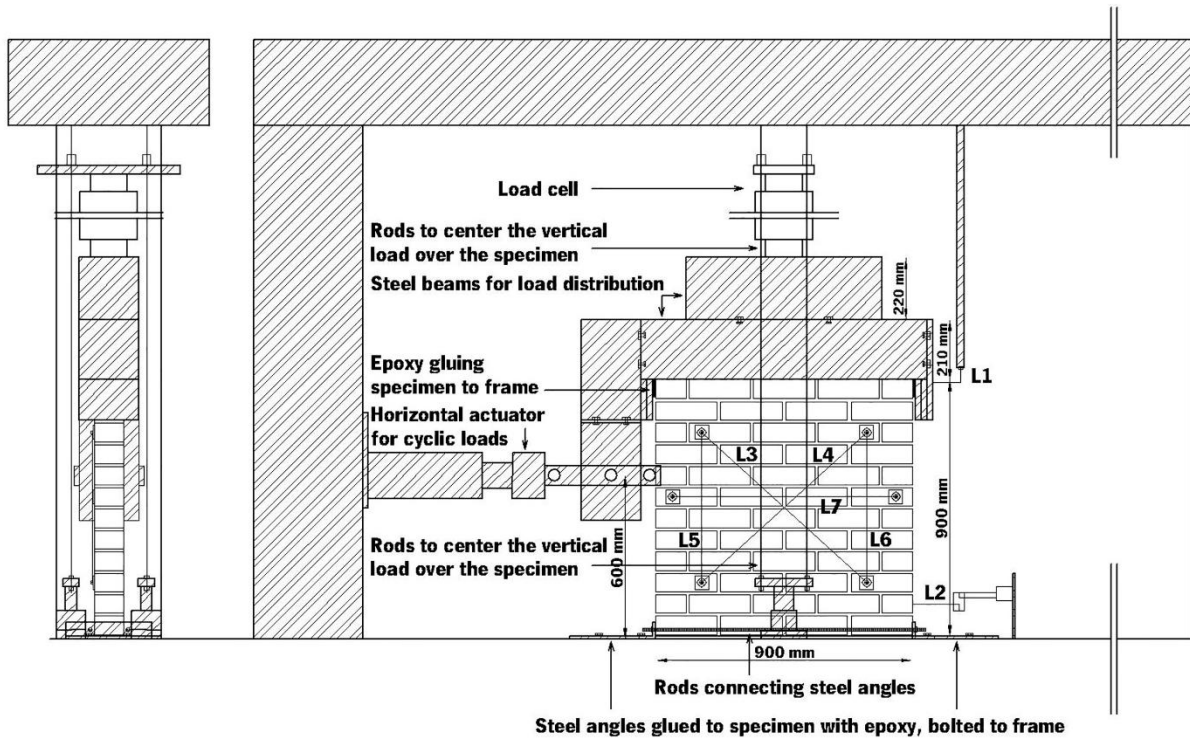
Illustration of setup used for in-plane cyclic loading of masonry specimens
